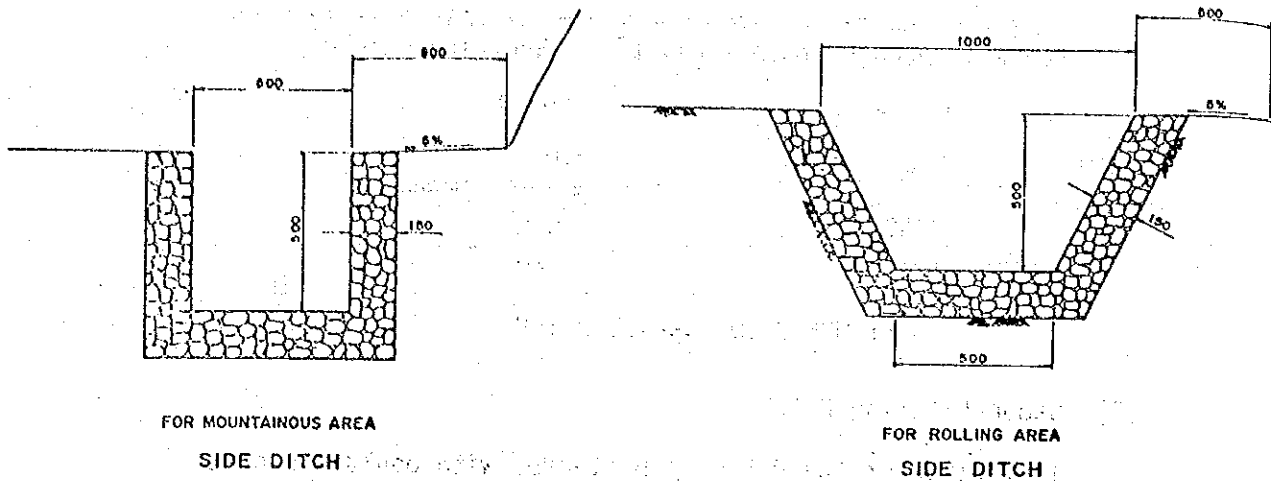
RECOMMENDED STONE MASONRY DITCH
